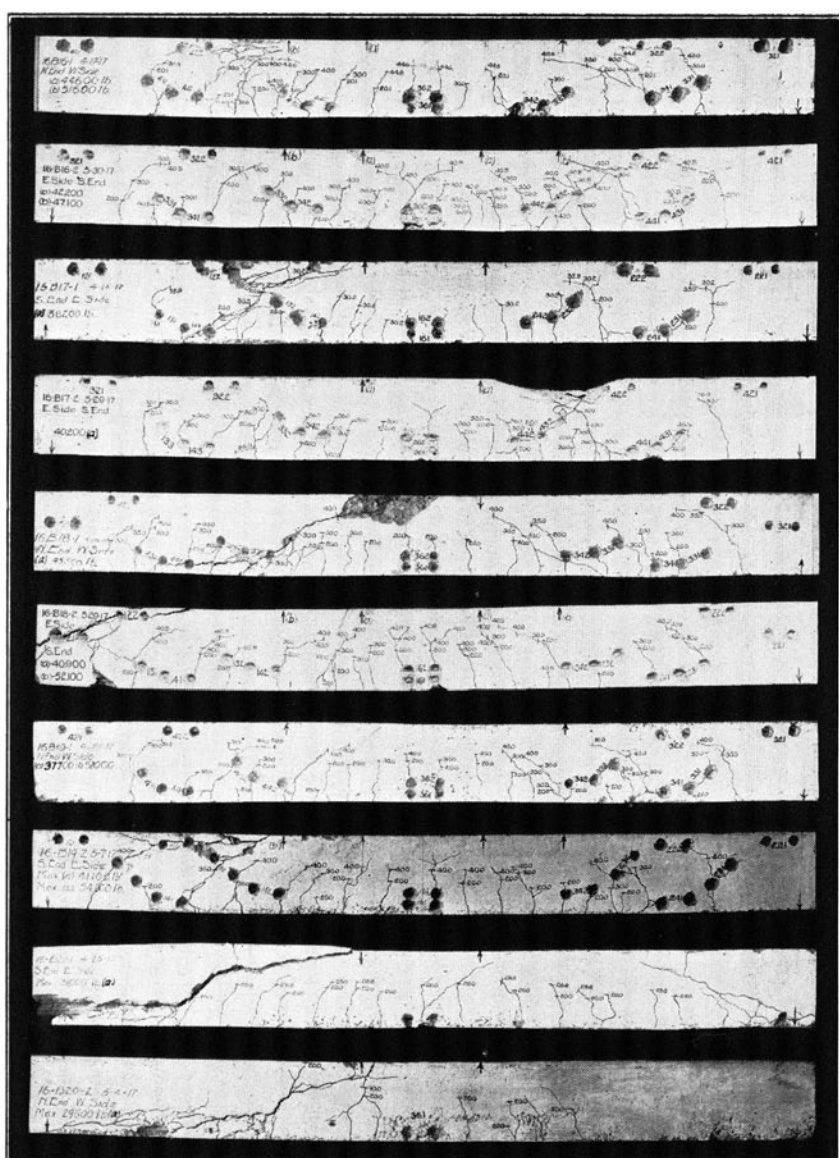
VIEWS OF BEAMS AFTER FAILURE, SERIES OF 1917
